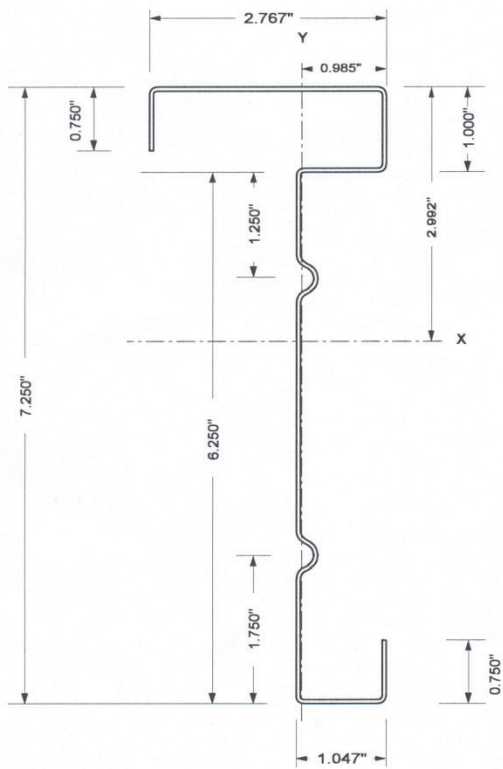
ULTRA-SPAN® TRUSS CHORD SECTIONS
